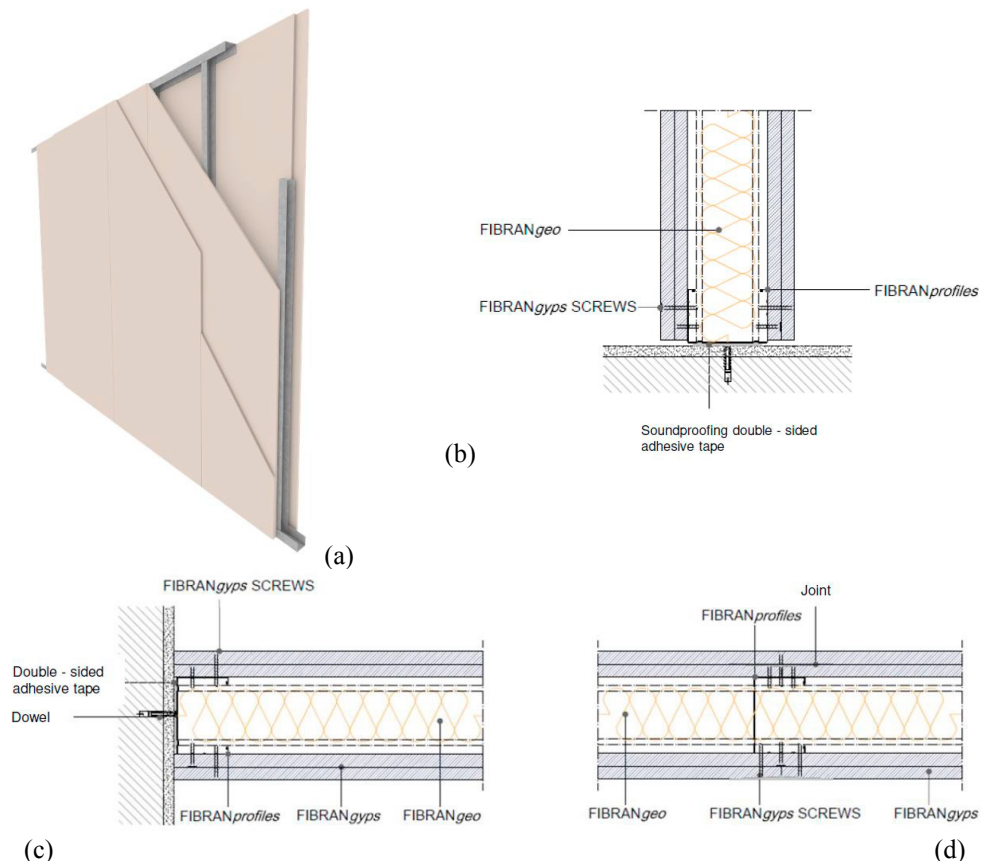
Typical internal partition: (a) perspective view; (b) floor connection; (c) side wall connection and (d) stud-panel connection.
